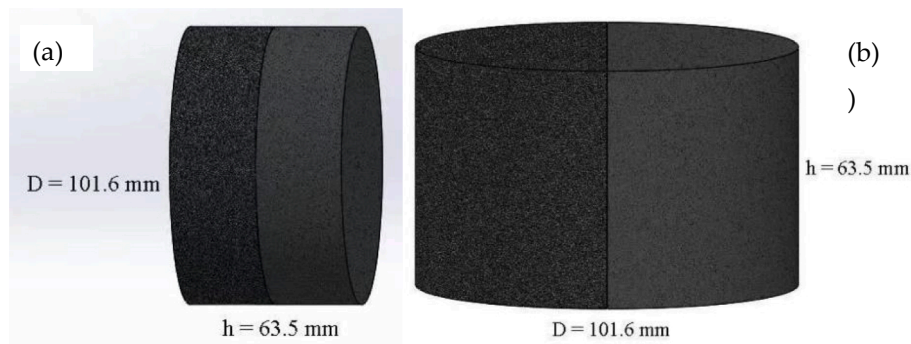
Specimen combination forms. (a. interlayer bonding specimen, b. section bonding specimen).
